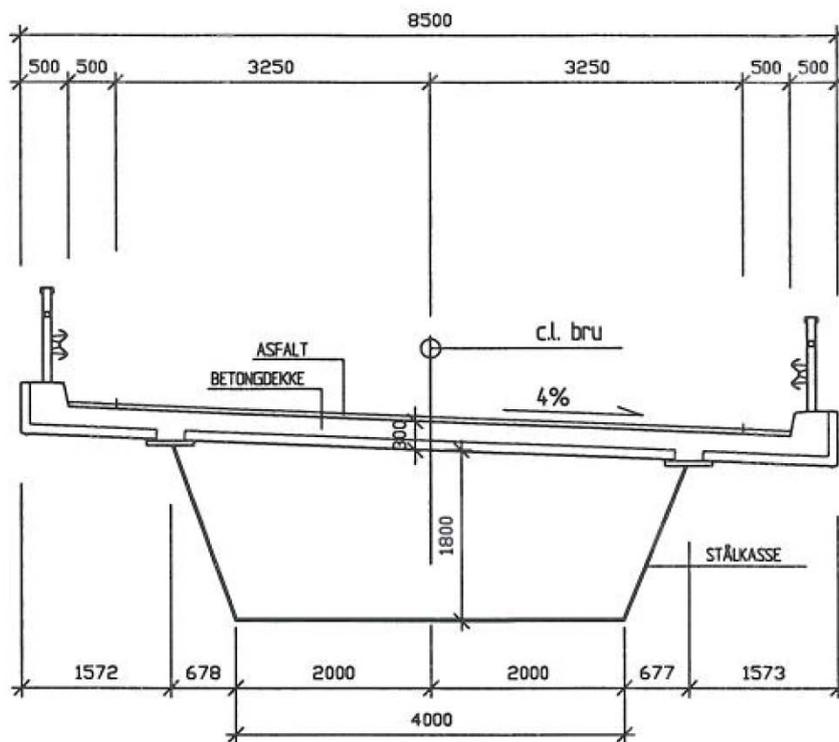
Klenevågen Steel Box Girder Bridge has an effective bridge width of 7,5 m.
